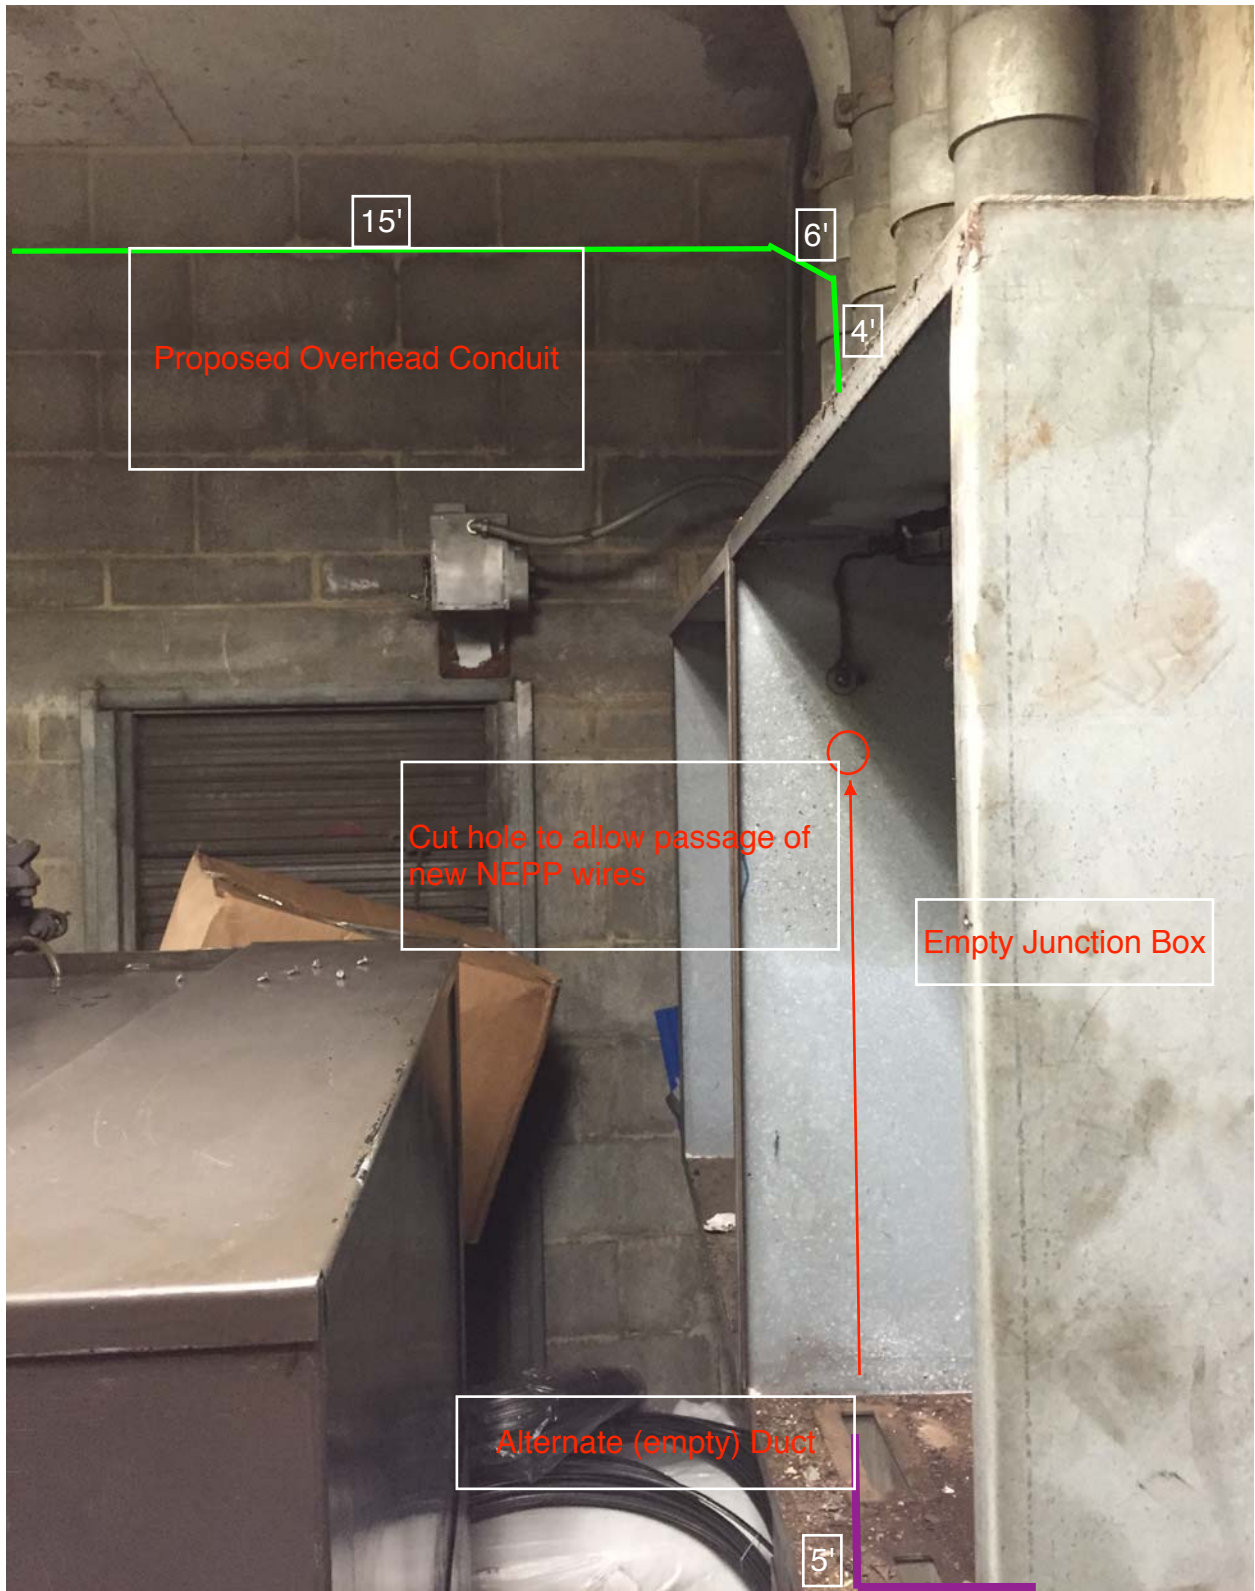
Proposed overhead conduit in Elevator Machine Room 205
